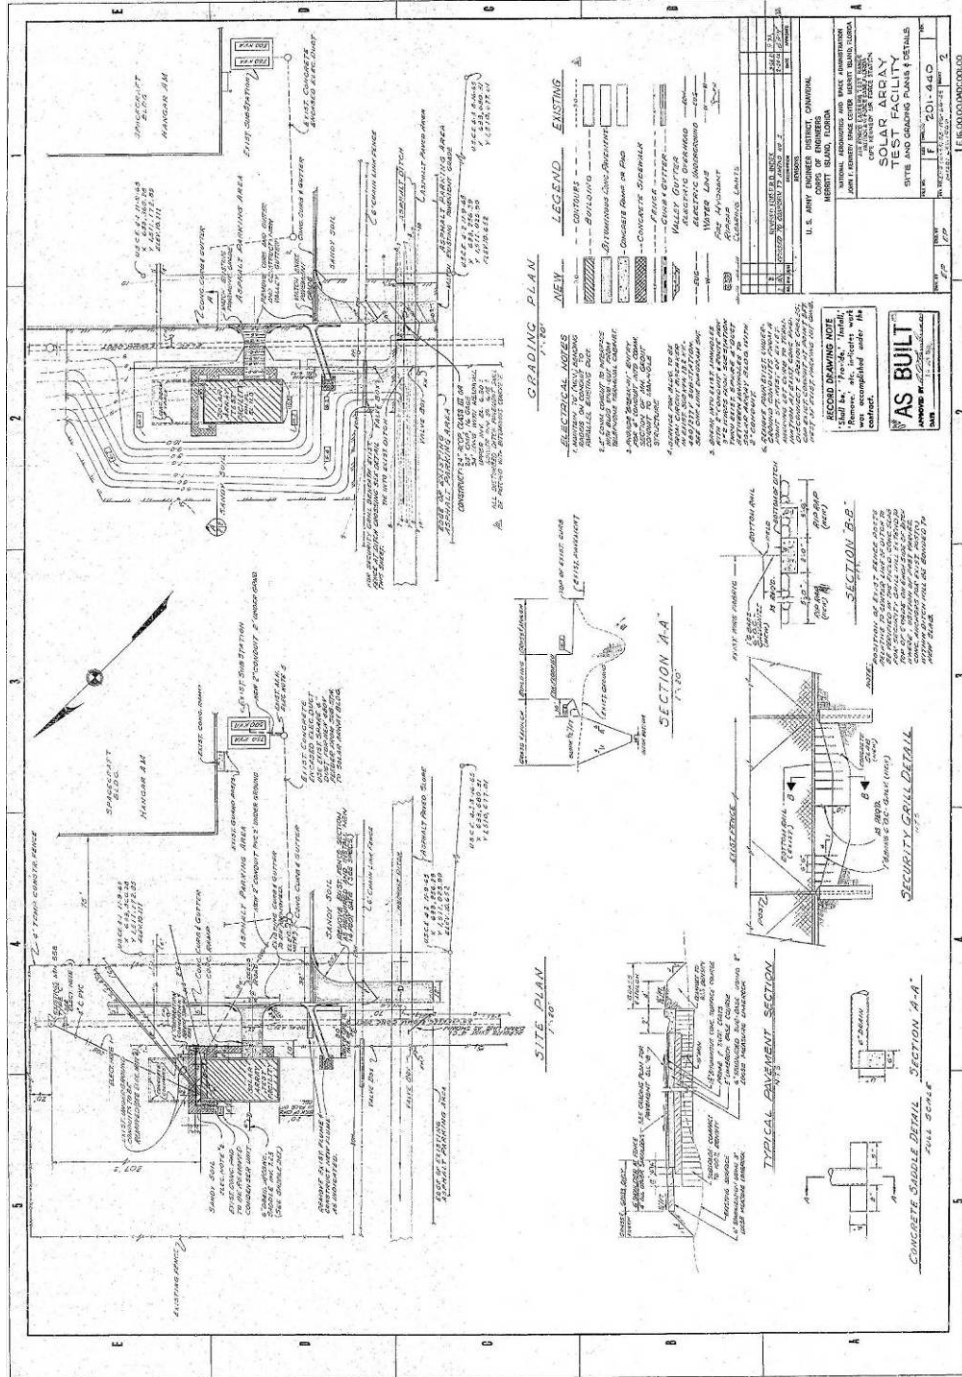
Adair, Brady & Fische, Inc., Solar Array Test Facility, Site and Grading Plans & Details, January 1966, Sheet 2.
